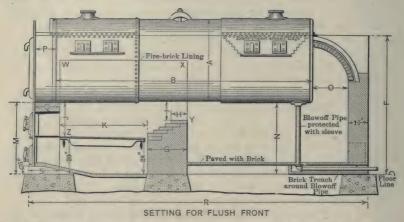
Setting of a Horizontal Return-tubular Boiler, Flush Front.
